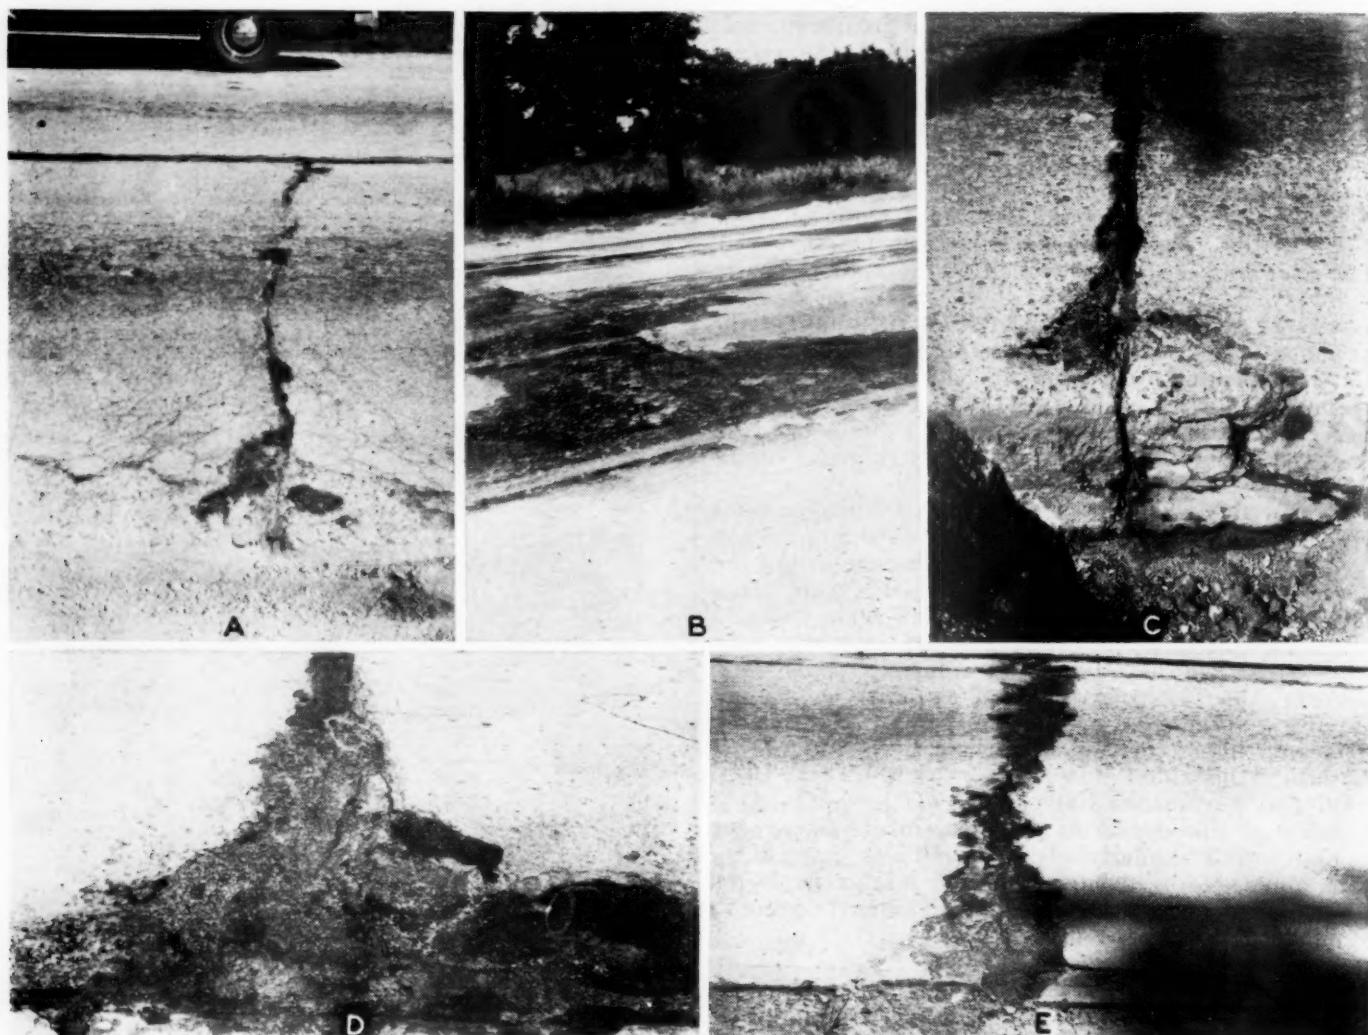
A, SURFACE DISINTEGRATION AT CORNERS FORMED BY CRACK; B, SCALING AT CORNERS FORMED BY JOINT, COVERED WITH CRACK FILLER; C, SMALL CORNER FAILURE AT CLOSED EXPANSION JOINT; D, SCALING AT CORNERS FORMED BY CRACKS COVERED WITH CRACK FILLER; AND E, SMALL CORNER FAILURE AT CORNER FORMED BY CRACK.
